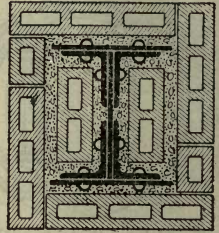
Rectangular Terra-Cotta Column Protection.
